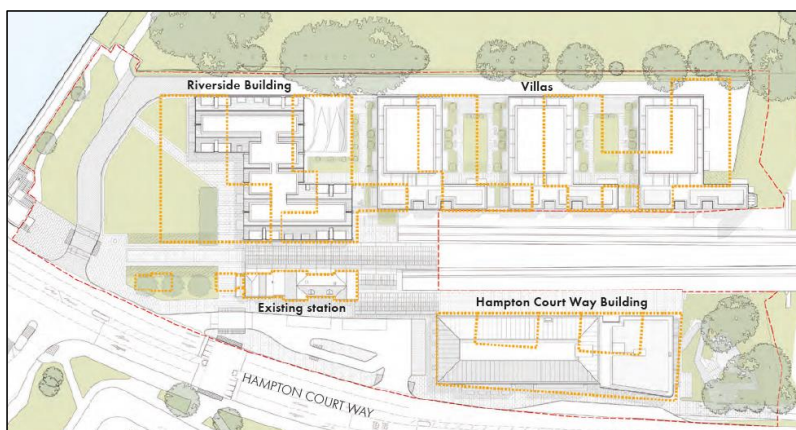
Masterplan detailing the proposed development together with the outline of the extant permission on the site (2008/1600)
